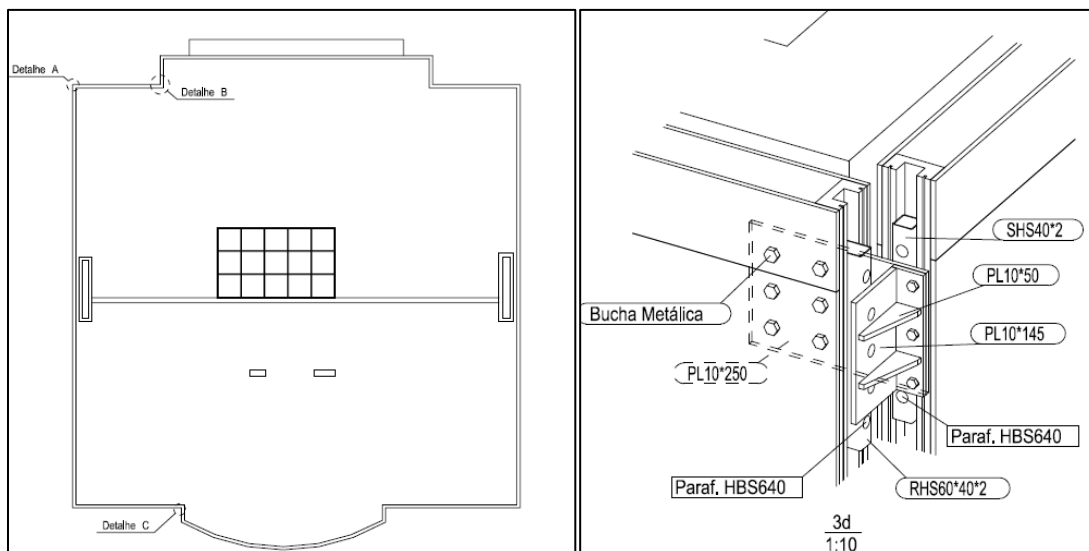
Roof plan and Details of the fixation of the panels in the existing wall. Detail A is relative to a protunding corner.
